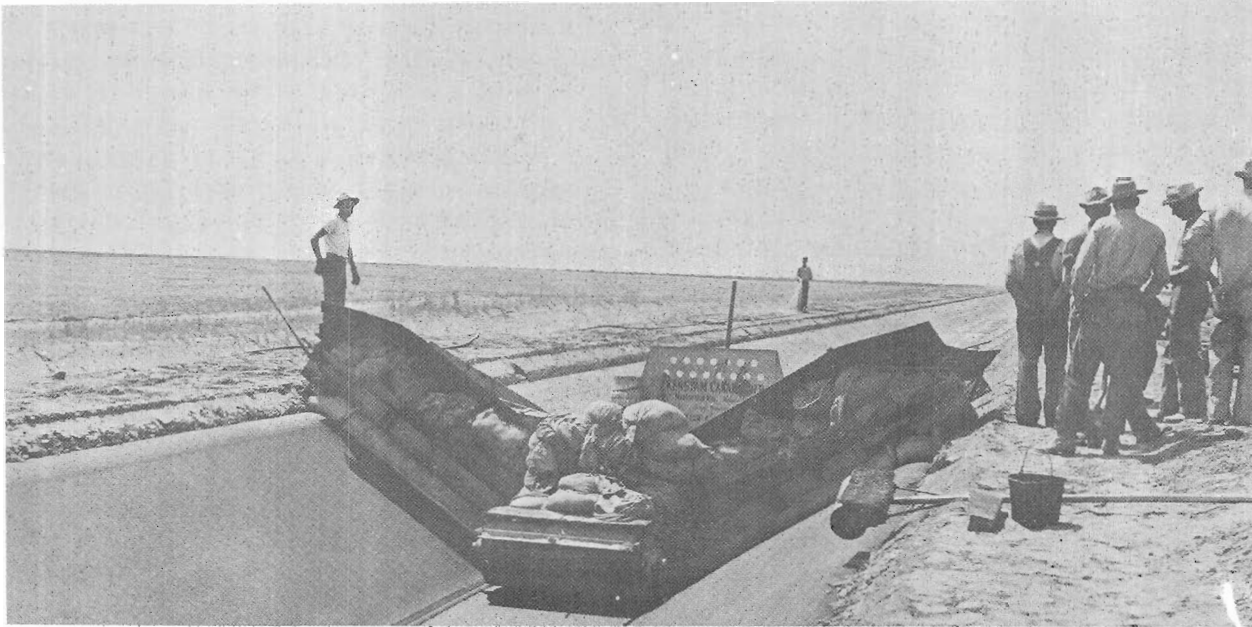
Slip-form lining machine placing asphaltic concrete in the Pasco Pump Laterals. CH-63-29, 1947.
